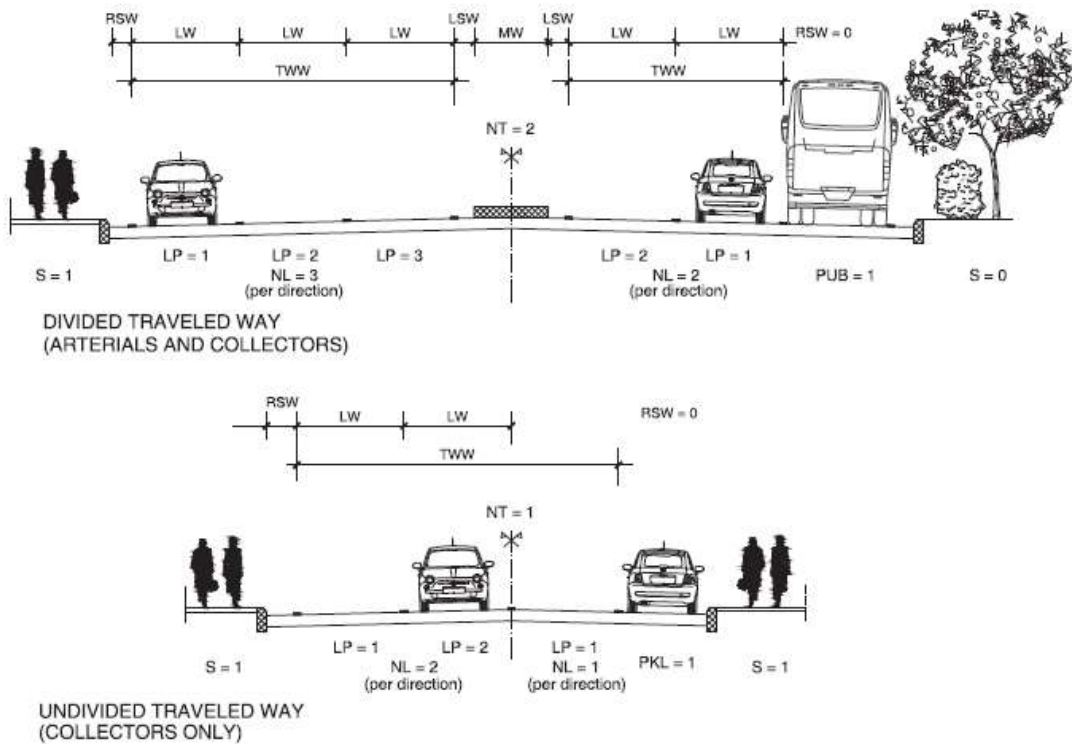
Transversal section parameters for divided and undivided carriageways. Taken from Bassani, 2014
